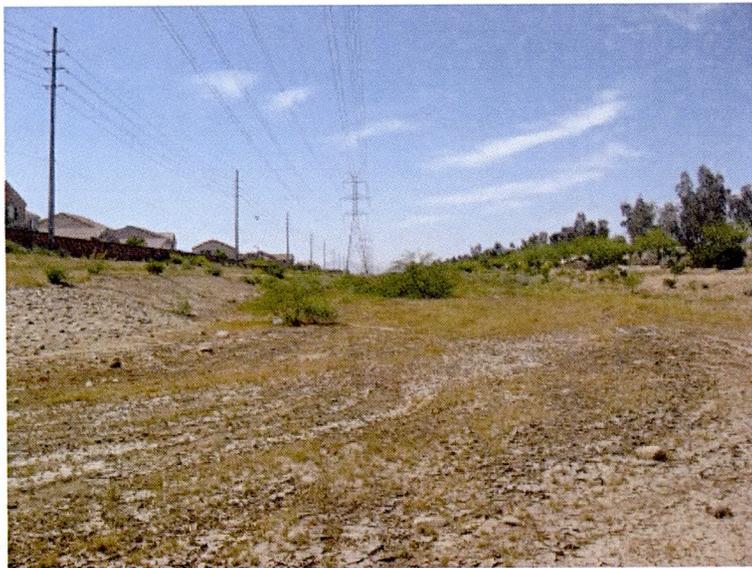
Facing south in channel at southeast corner of intersection N. 115th Ave. and W. Union Hills Dr.
